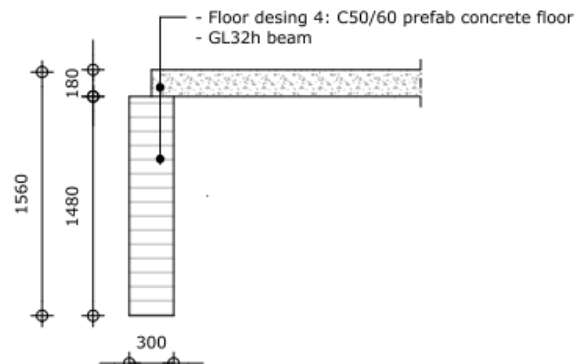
Floor design 4 glulam beam detail cross-section D-D in mm
